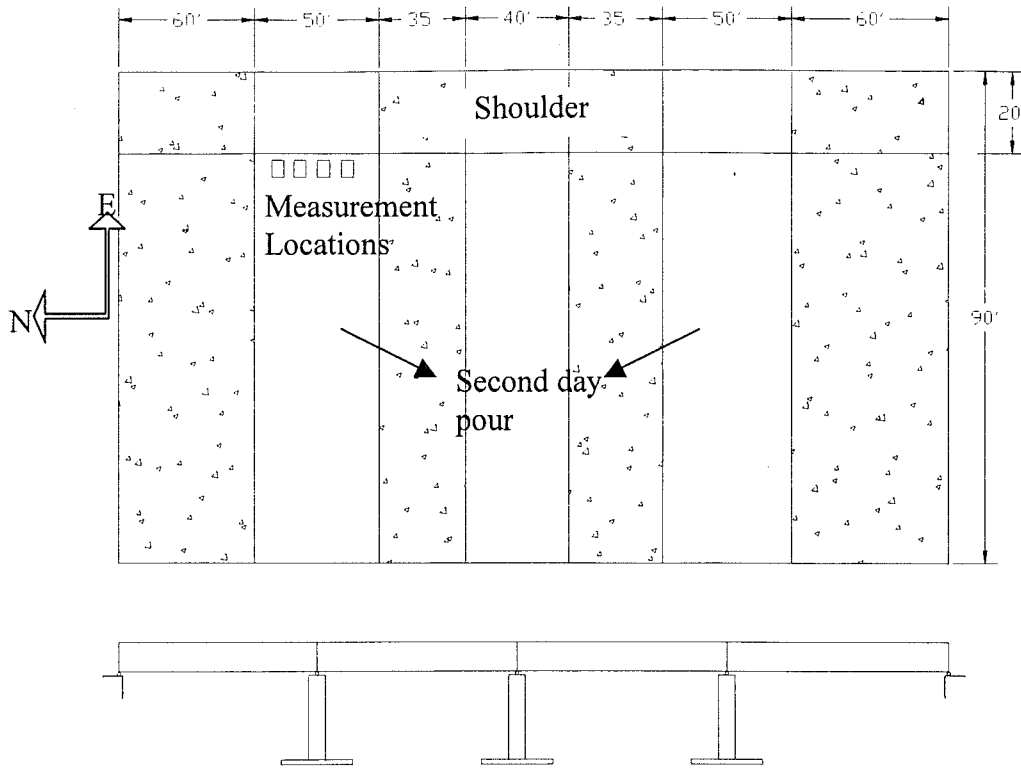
Plan and Cross-Section of Woodward Ave. over I-94 (B2)
